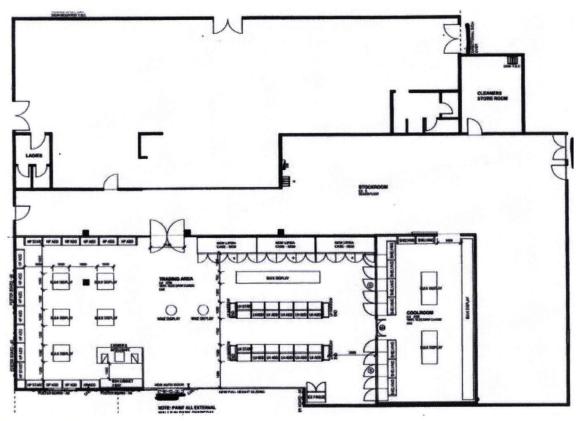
Expanded Bottle Shop - Floor Plan and Shop Layout.
